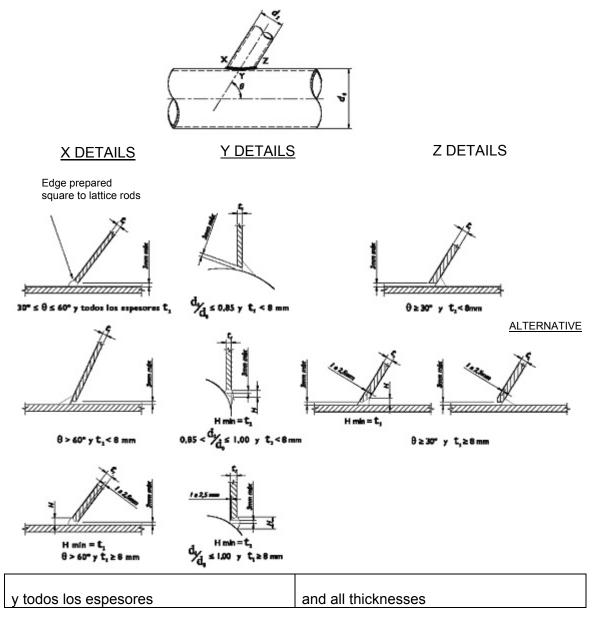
c Weld preparation and fit-up. Construction details of typical welds circular hollow sections
